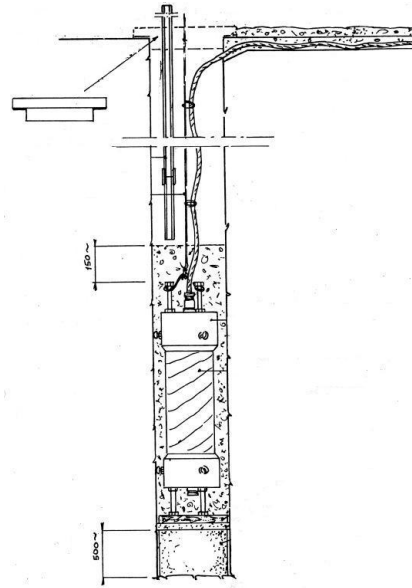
Explanatory drawing of a vibrating wire strain gauge
